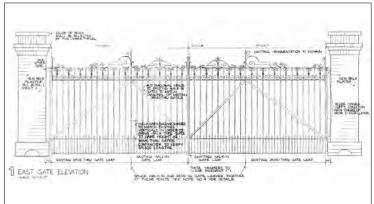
Detail of construction drawing for widening of gates at Oakwood Cemetery, 1980 (City of Austin)
